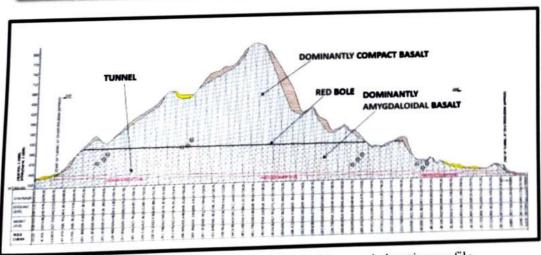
&5:- Proposed Tunnel look like above picture and elevation profile
